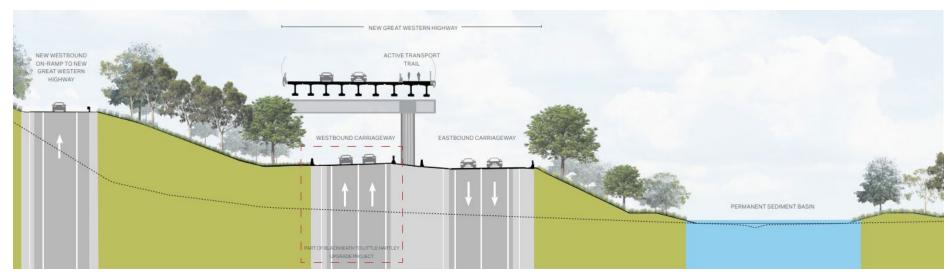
Typical cross section of the realigned bridge forming part of the realigned existing Great Western Highway
